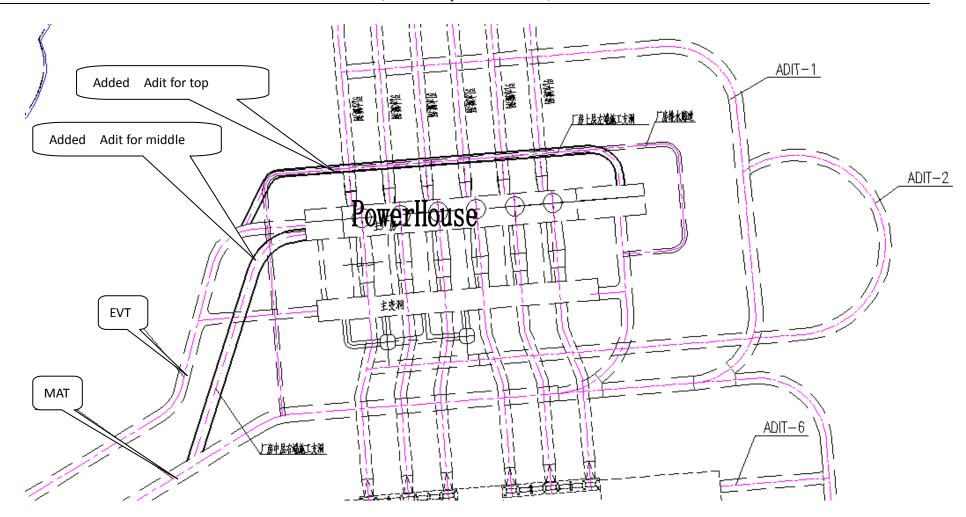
Layout of added construction passages in the upper and middle parts of powerhouse
